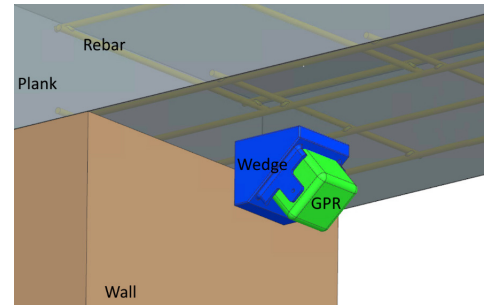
An angled GPR sensor scanning the load-bearing end of a reinforced concrete plank supported by a wall
